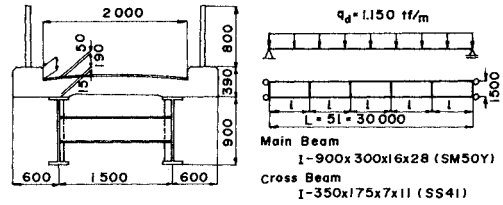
An Example of Stability Design for Two Parallel Girders.
